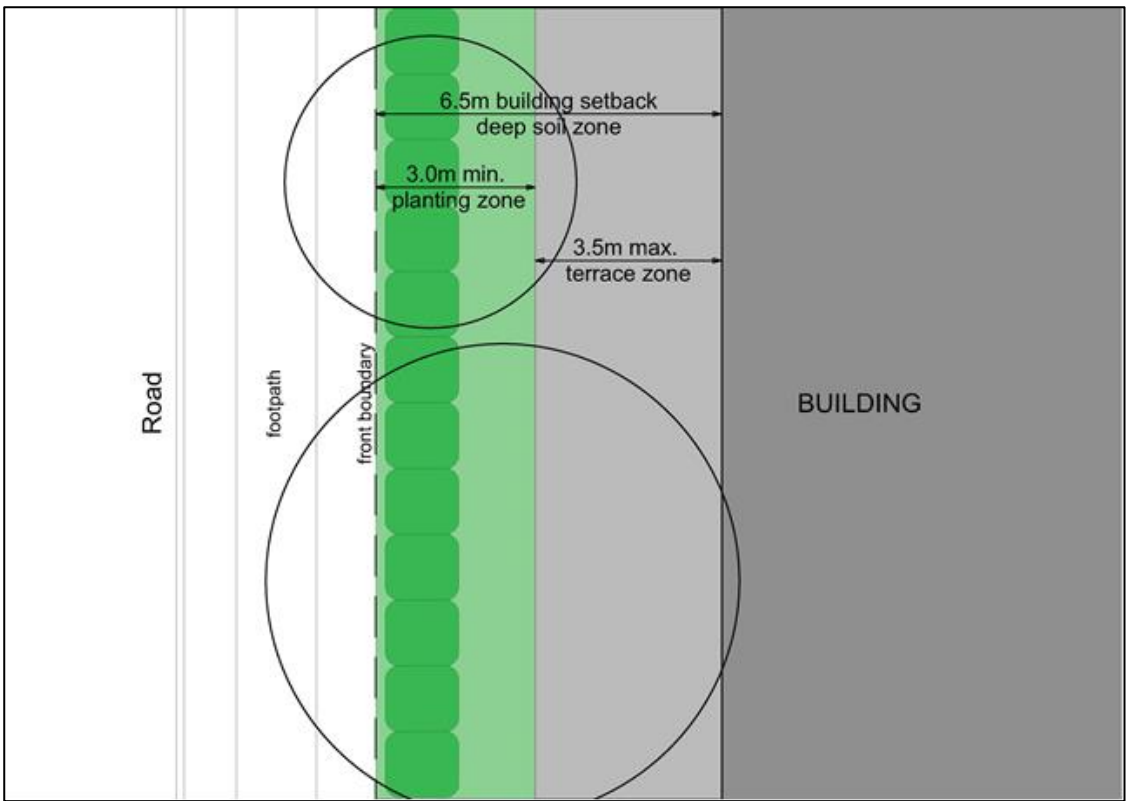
Landscaping with deep soil planting zone at 6.5m setback Pittwater Road boundary demonstrating deep soil zone
